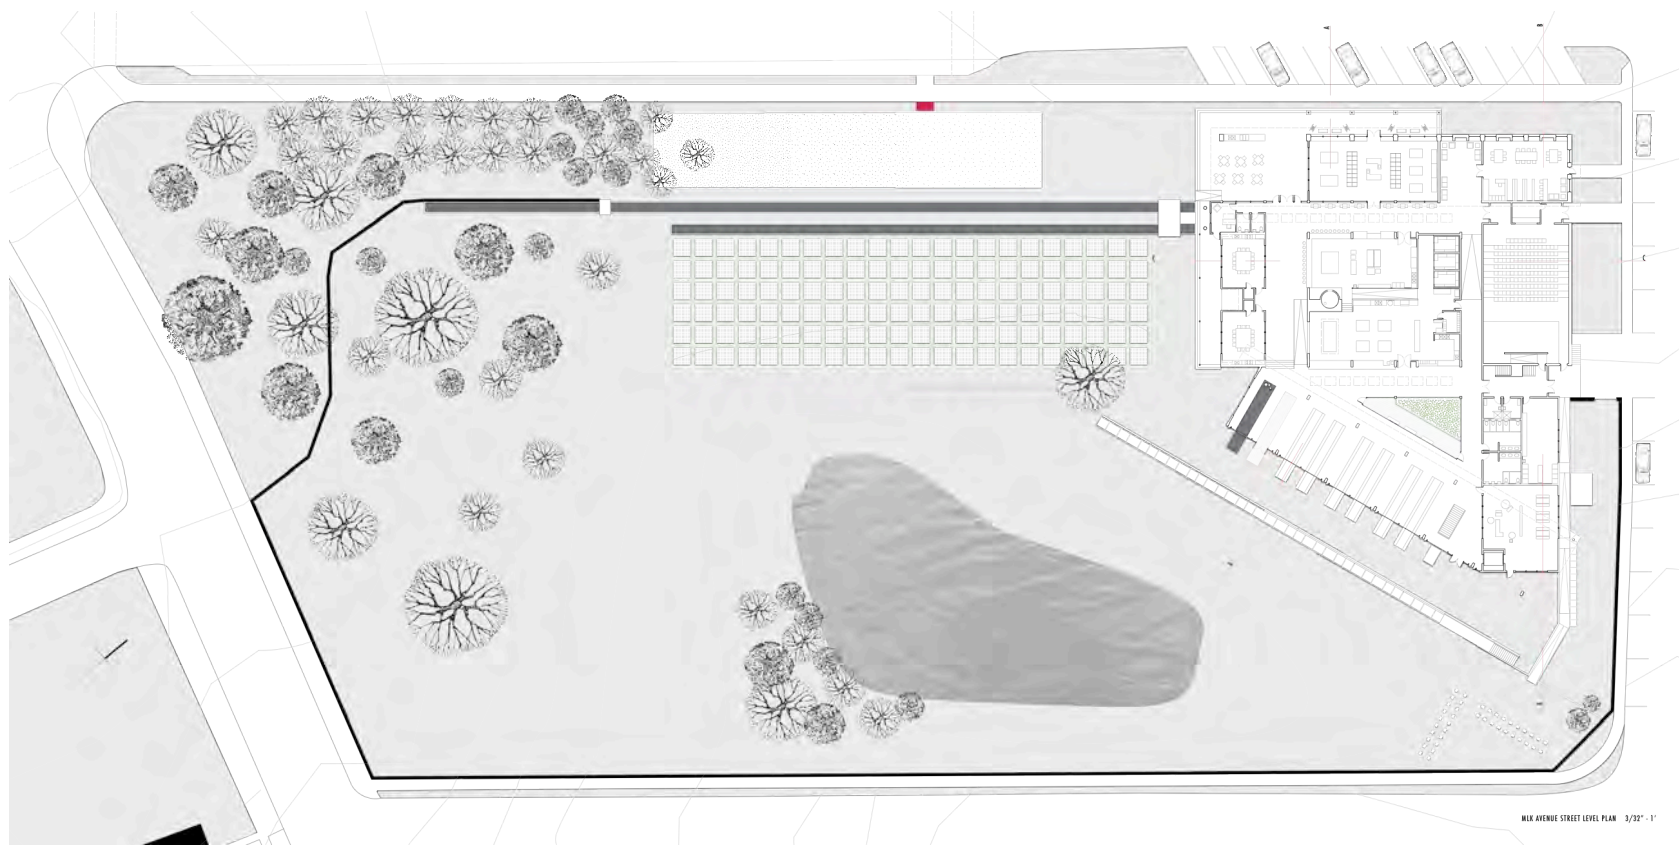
Five Points Community Food Center Street Level Plan. (Author).
